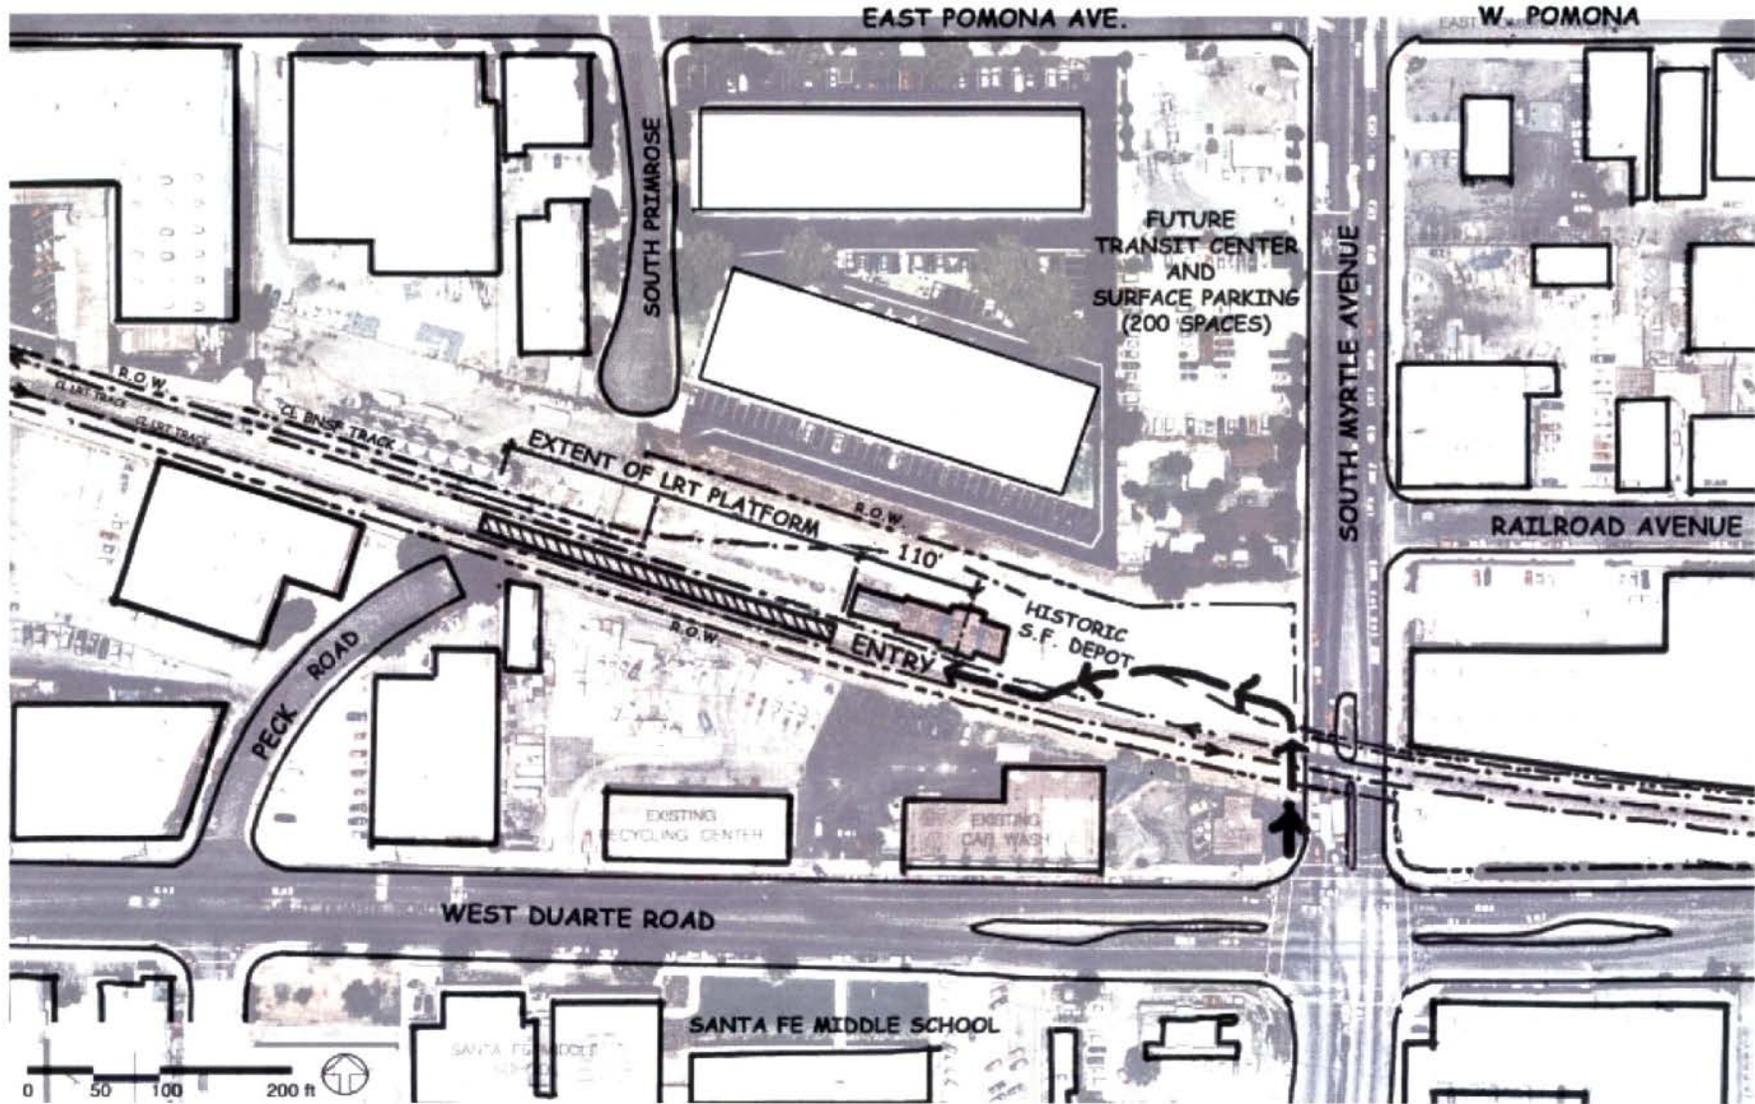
Site Plan: City of Monrovia Station, 3-Track Alternative
